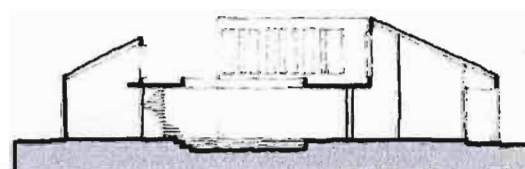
BDG – House Suttie (1969). Section. Ref: *Plan 74.3*: p7.
